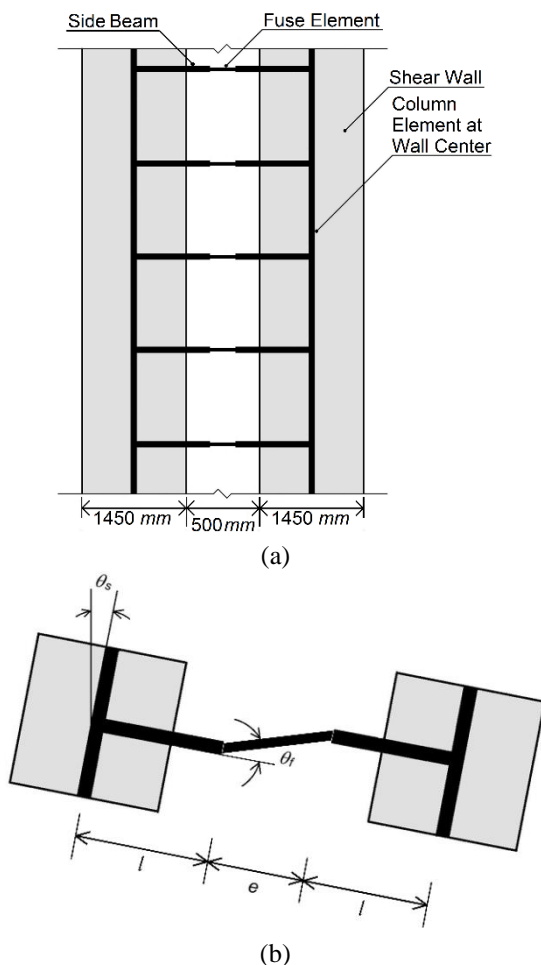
Coupled shear wall with fused coupling beams. a) Modeling of coupled shear wall with steel fused coupling beams, b) Deformed fused coupling beam
